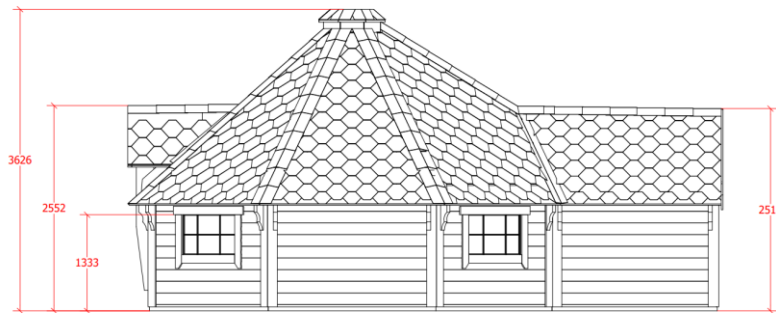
Elevations of the smaller cabins to be located at the north western end of the application site
